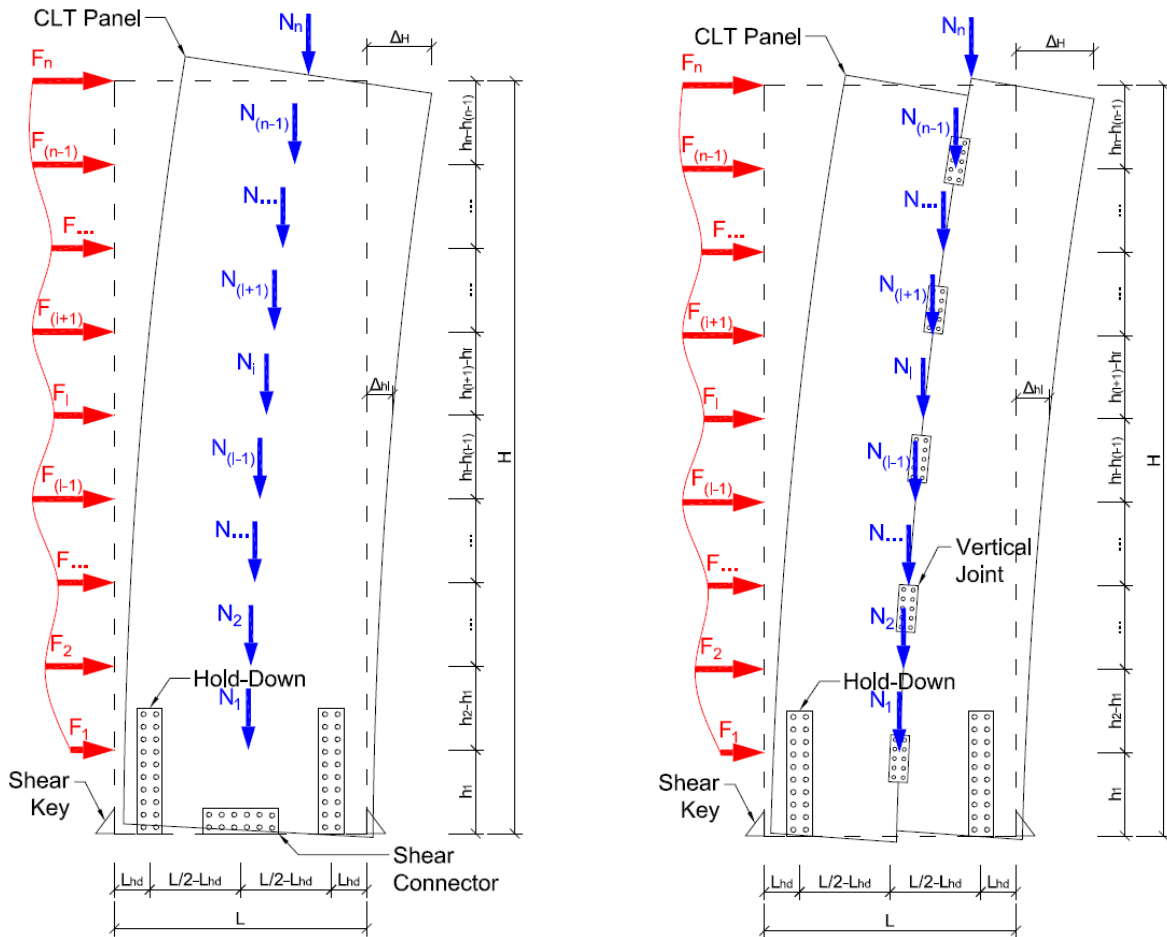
Mechanics-based models for single-panel (a) and coupled-panel (b) balloon-type CLT shear walls.
